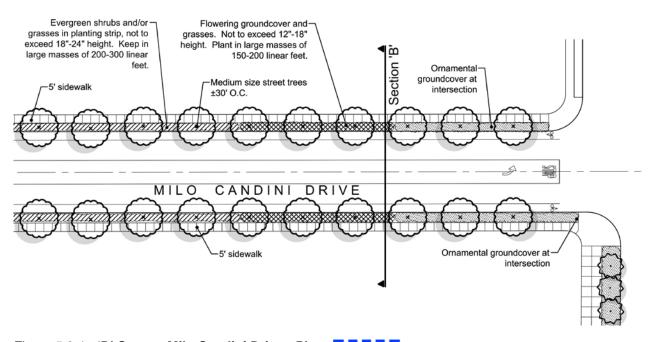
'B' Street - Milo Candini Drive - Plan
